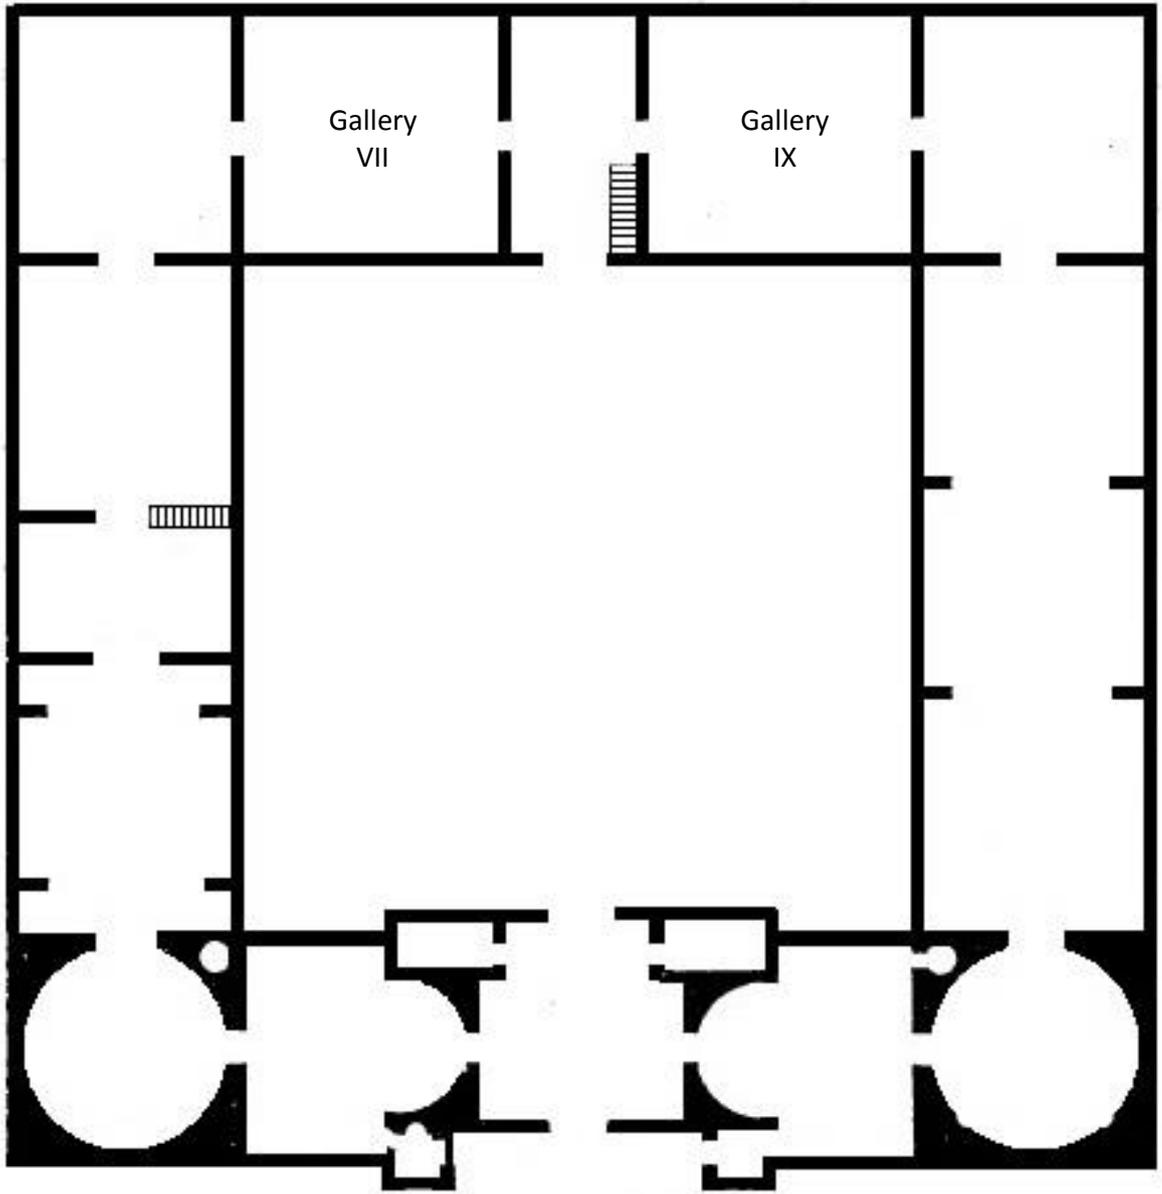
Floor plan of the Glyptothek. Image author's own
